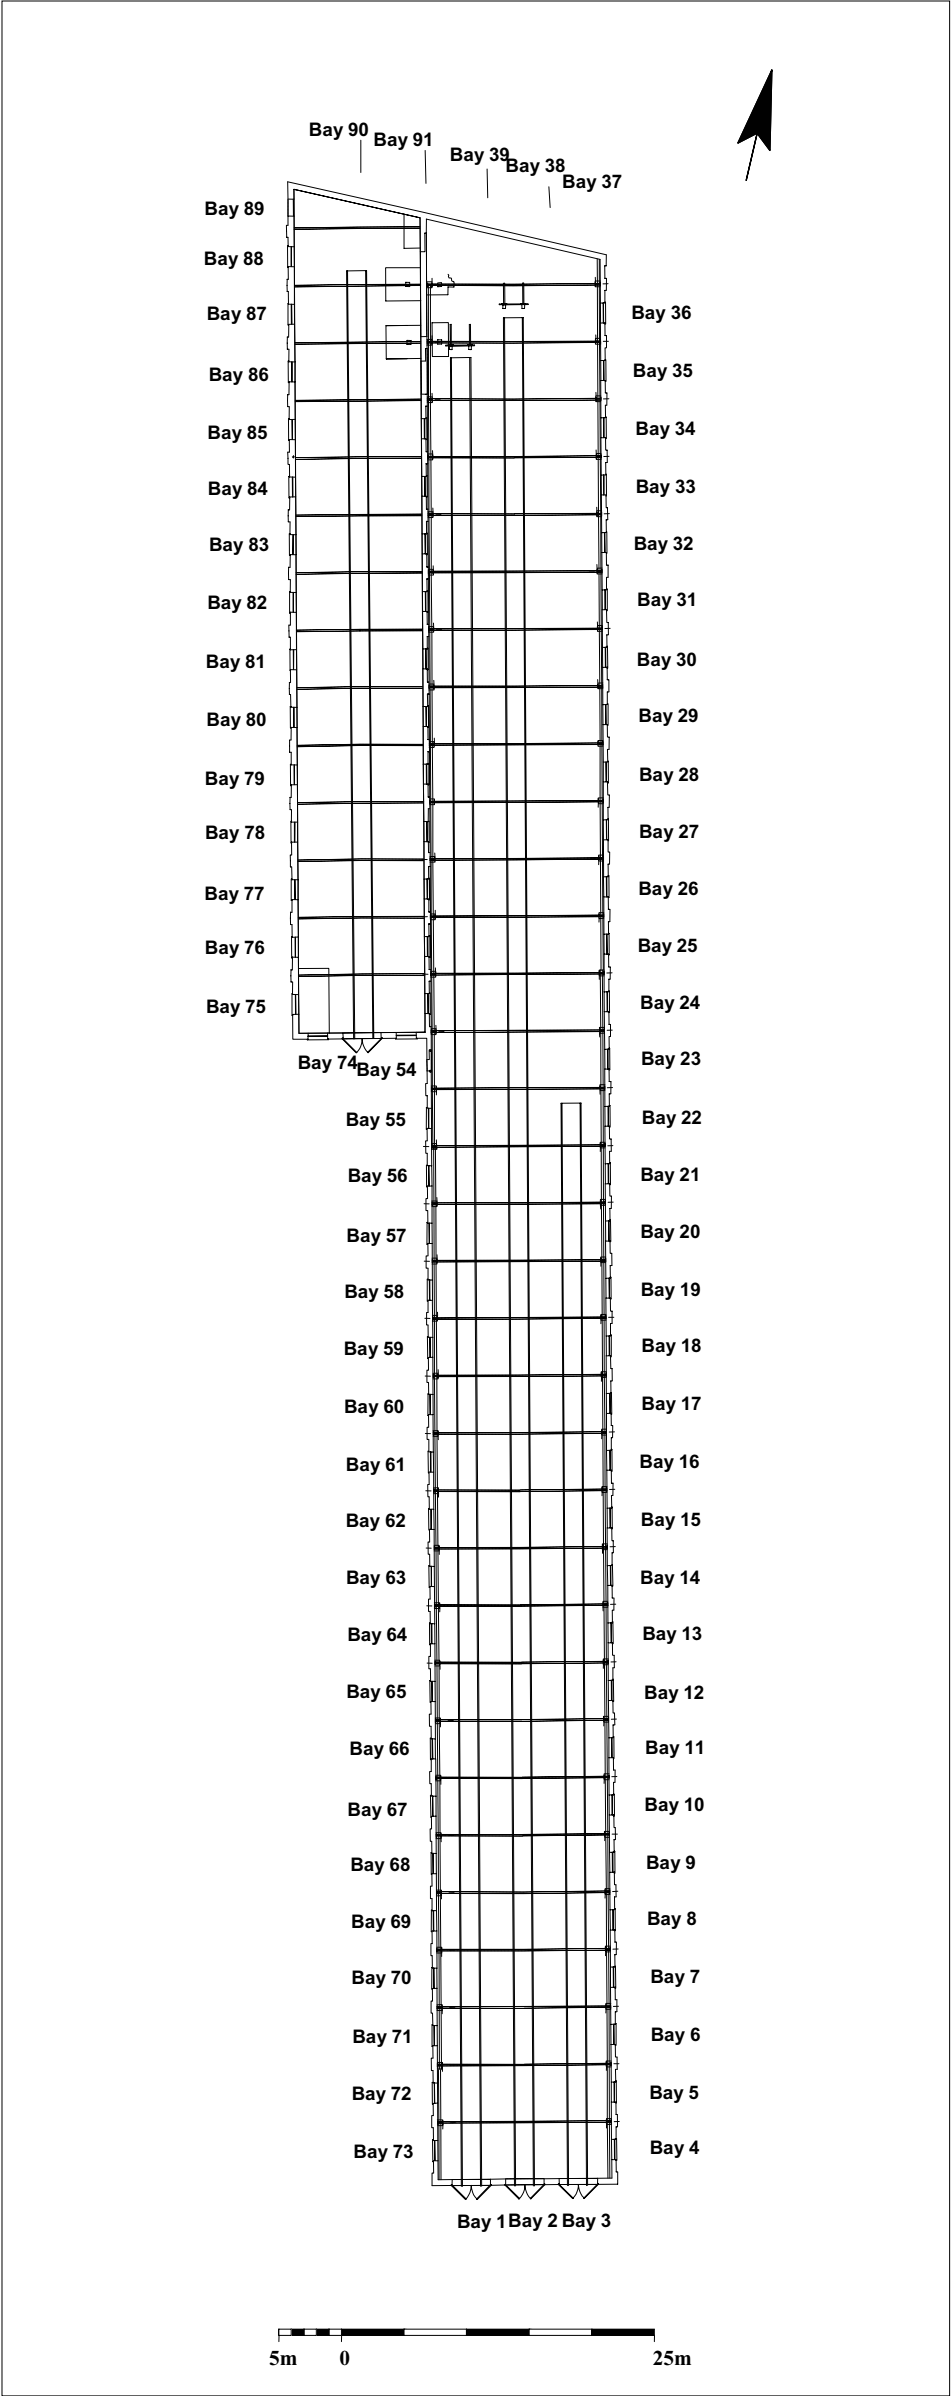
Royal train shed plan (based on drawing ref: 11887 RTS Floorplans OS grid1.dwg supplied by Willmott Dixon)
